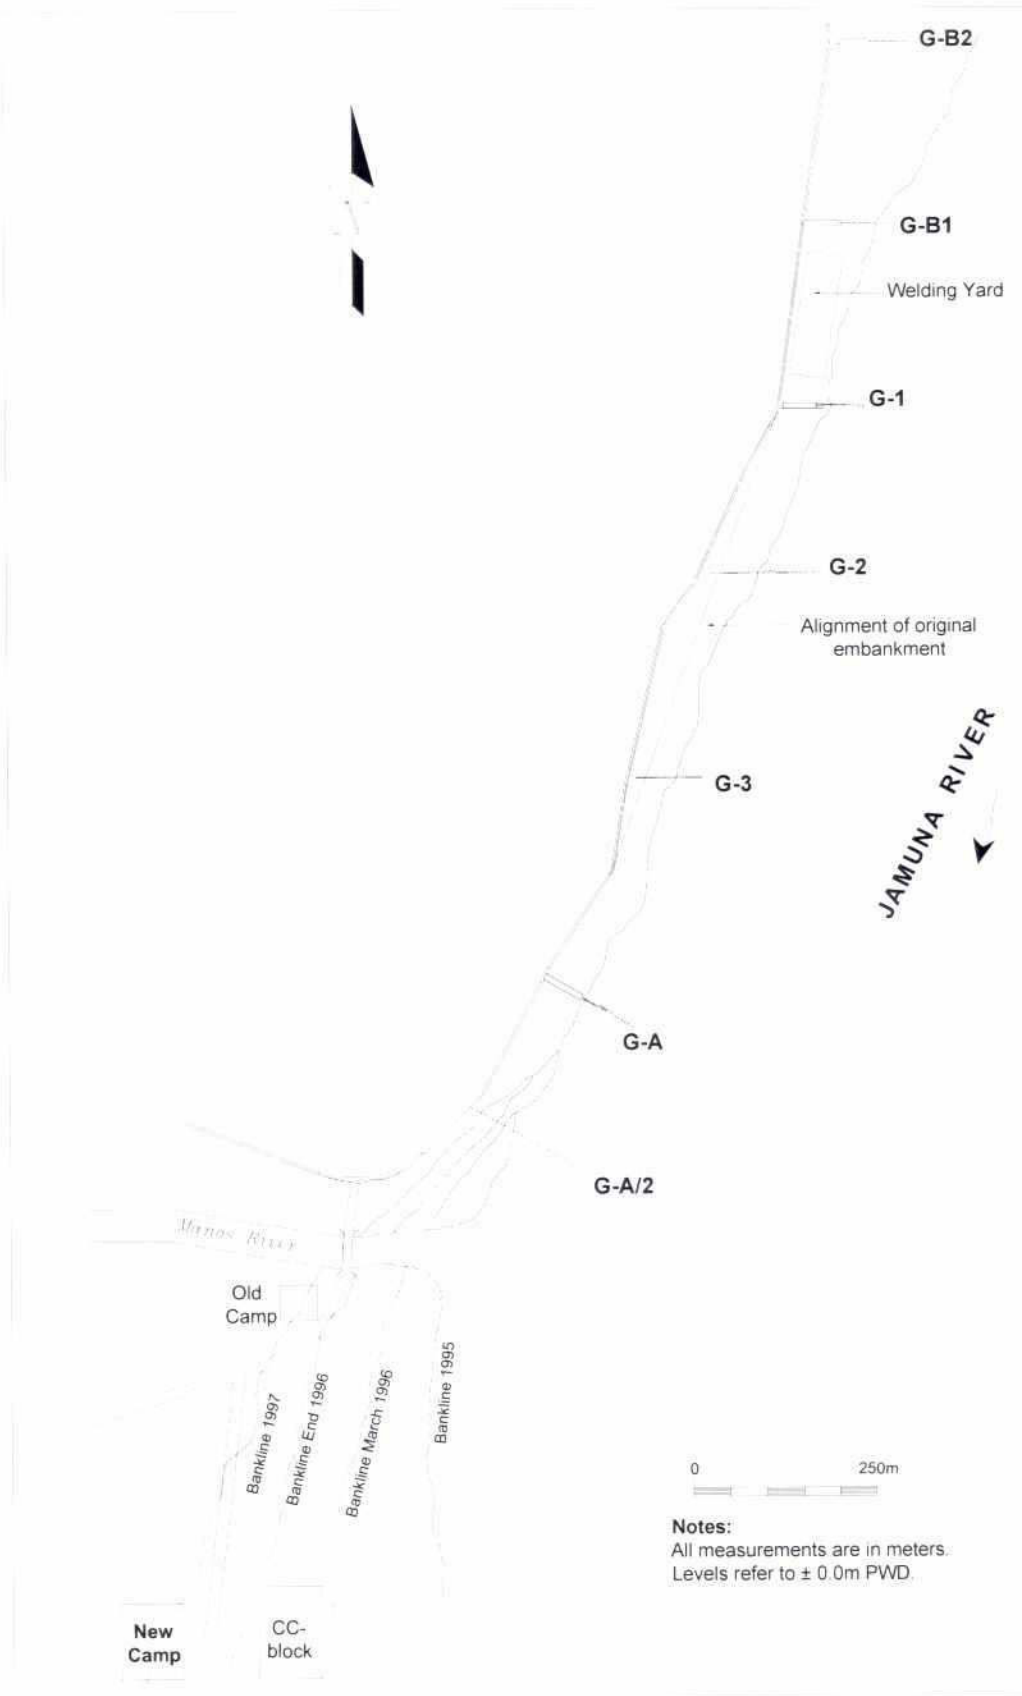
General Layout of Site Installation – Adaptation of Test Site I
